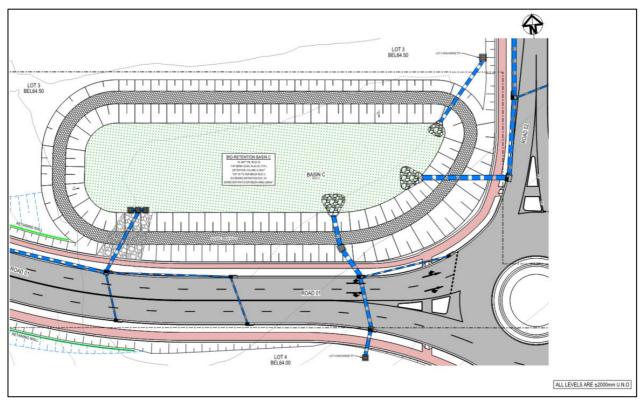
Bio-retention basin C detail plan (Source: At&l 2021)
